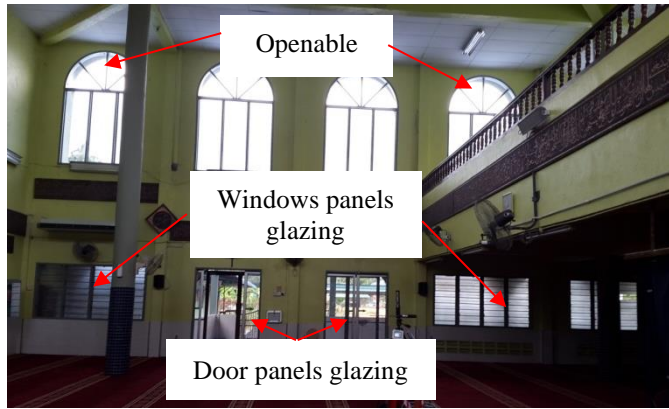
Example of a glazing area (i.e., opening, windows and doors) (MQS06).
